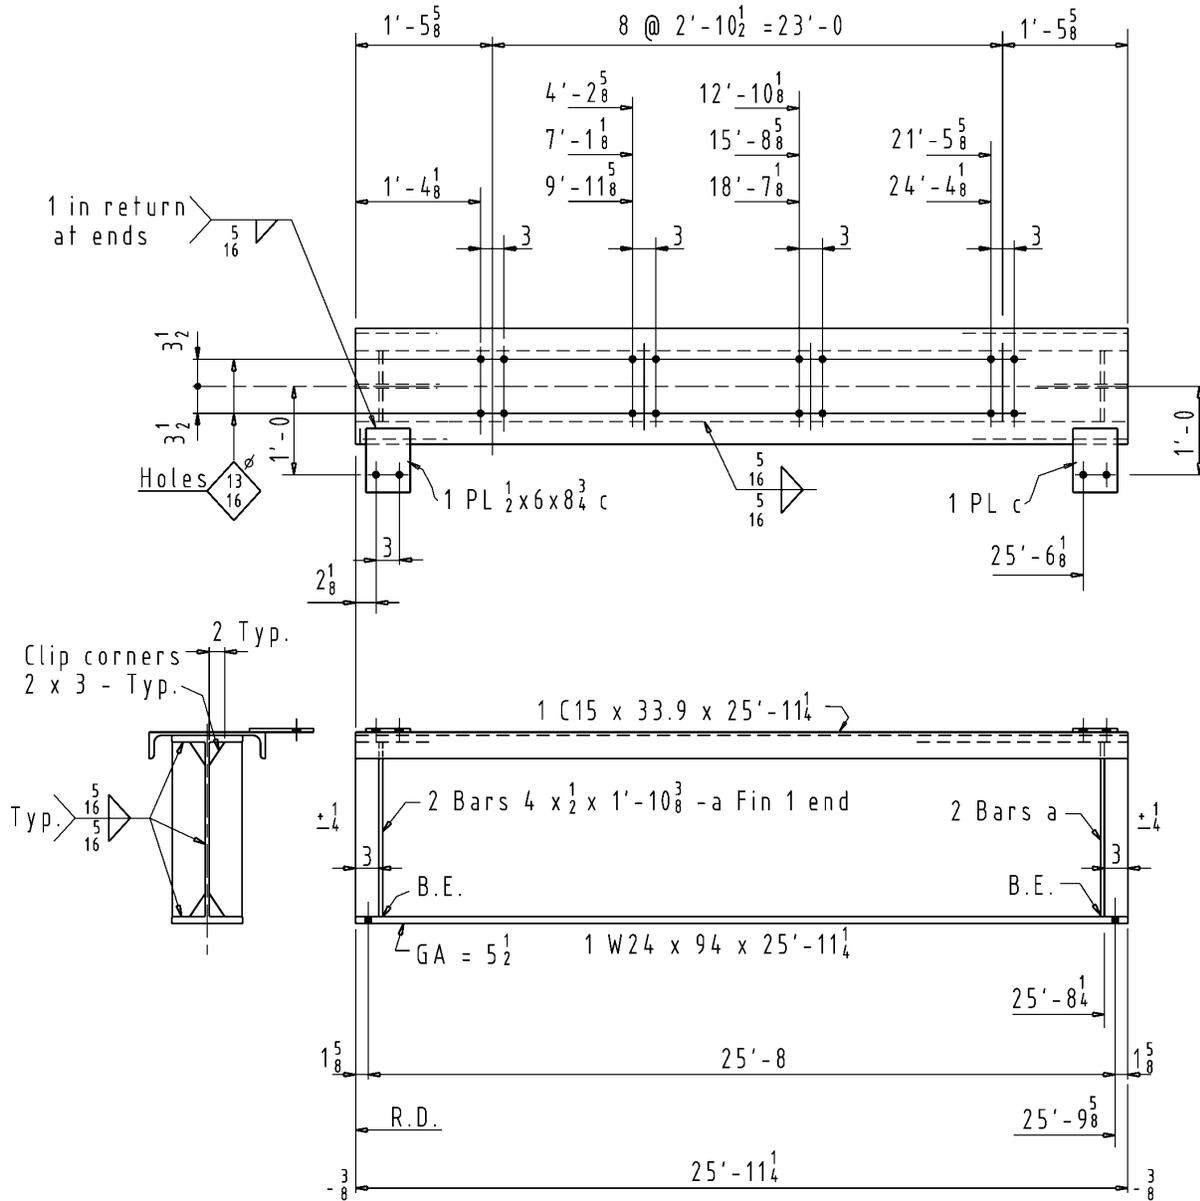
and 7-68b show two types of crane runway girders. Figure 7-68a shows a girder comprised of a W-shape with a channel welded to the top flange. Figure 7-68b illustrates the case when heavy crane loads are to be supported. Such cranes frequently require the strength of a built-up runway girder, reinforced at the top flange by a horizontal girder.
